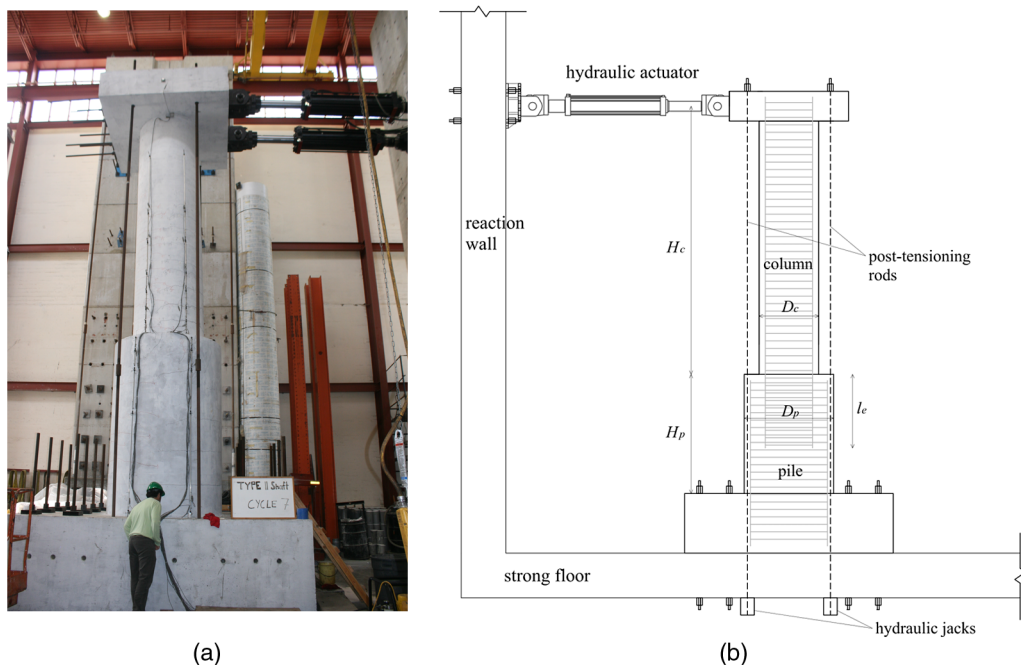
Tests on column-oversized pile assemblies: (a) test specimen; (b) test specimen geometry and setup
